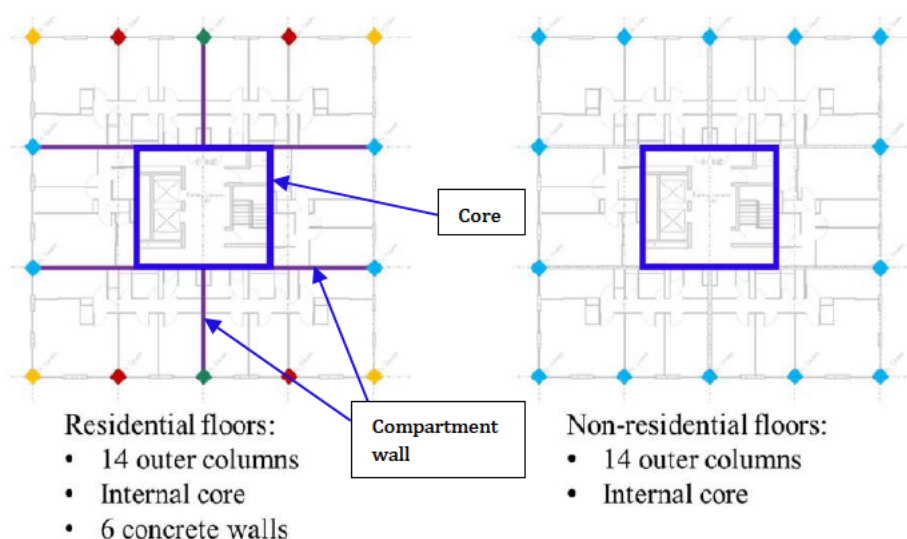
Typical structural floor plans (taken from Arup Report see C1)
